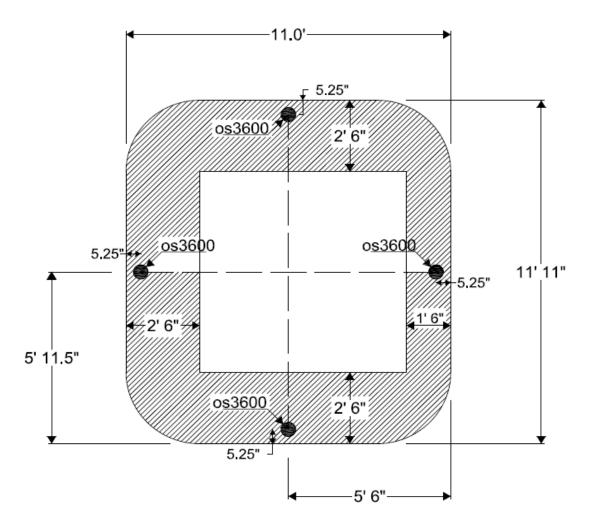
Cross-section of pylons 6 East and 6 West showing location of strain sensors at lift T4 (elevation 115.5')
